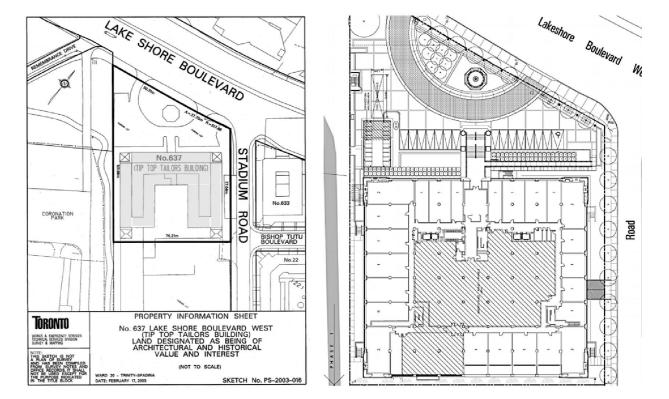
Built form of Tip Top Tailors Building (City of Toronto, 2003)
